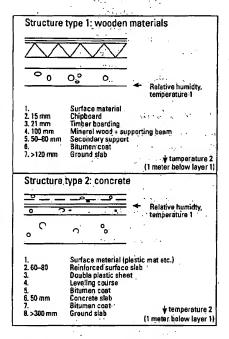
Examples of base floor structures in the stone school (A), categorized as wooden structures (type 1) and concrete structures (type 2). See Table 1.
